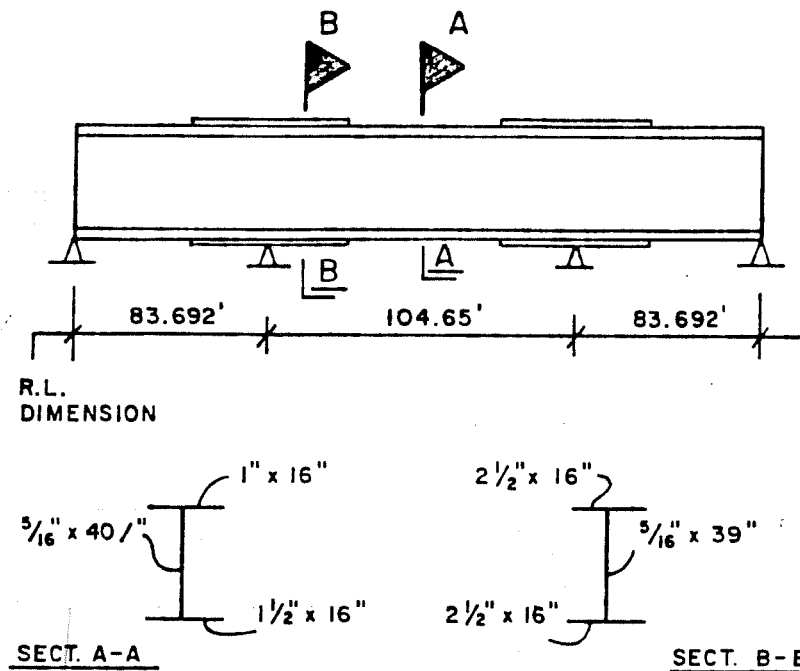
Cross section of typical girder in three-span bridge unit.
